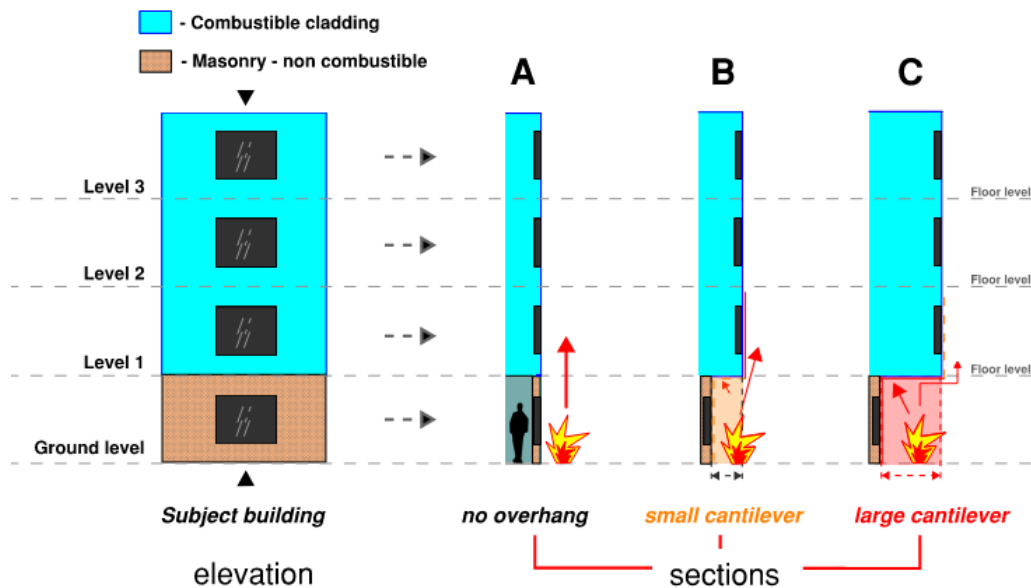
Subject building in elevation with non-combustible (masonry) walls at ground floor level and combustible cladding installed to levels 1, 2, and 3, including the soffits of examples B and C
